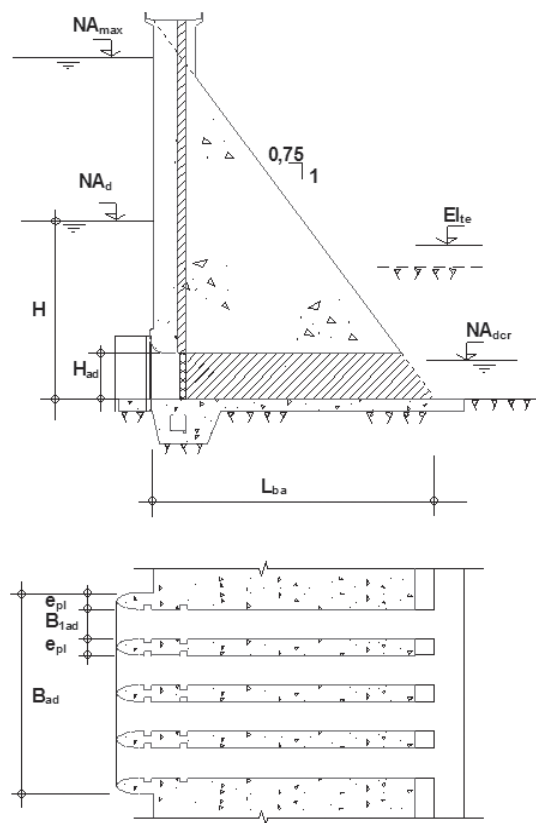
Typical cross-section and plan of sluiceways in a concrete gravity dam.
